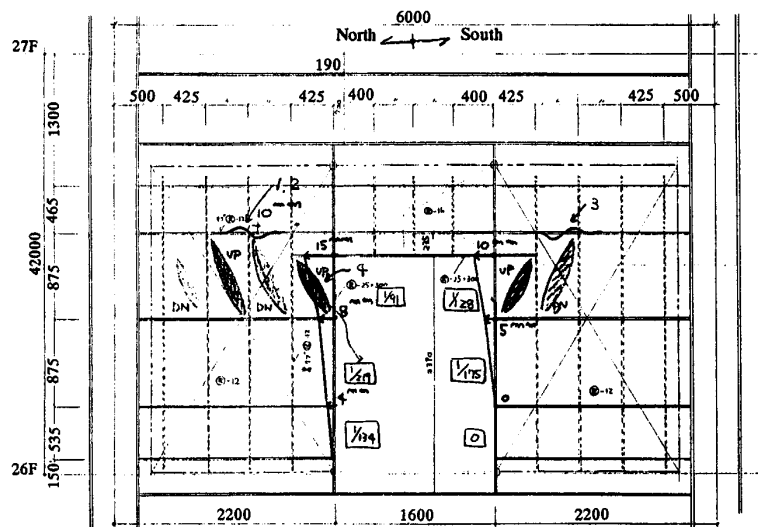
Sketch of plate buckling at 26th story of Kobe City Hall Building (Fujitana et al., 1996).
